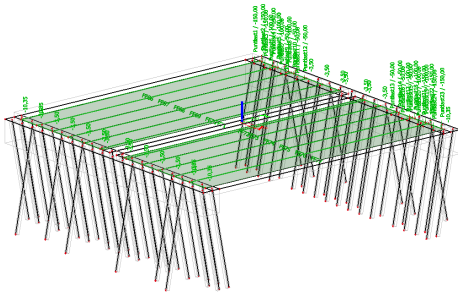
Governing load situation (load situation 4) for traffic loading on the FEM model for a single span box girder bridge
